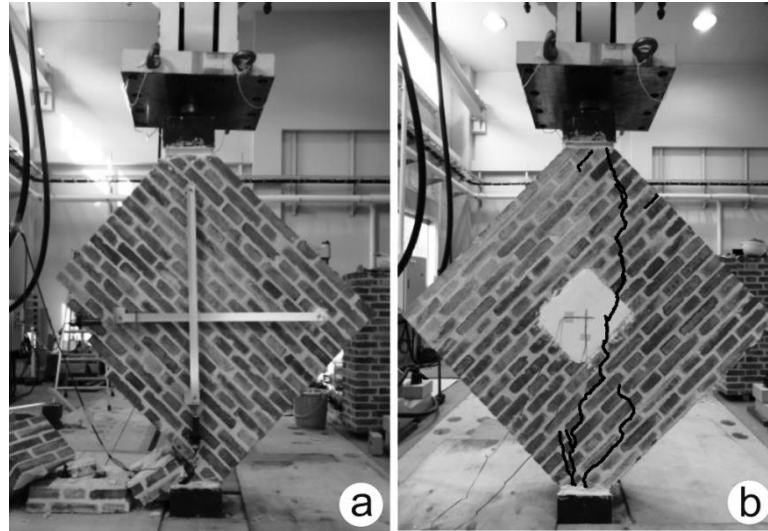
Failure modes of masonry panels subjected to diagonal compression test; (a) non-diagonal failure; (b) diagonal failure.
